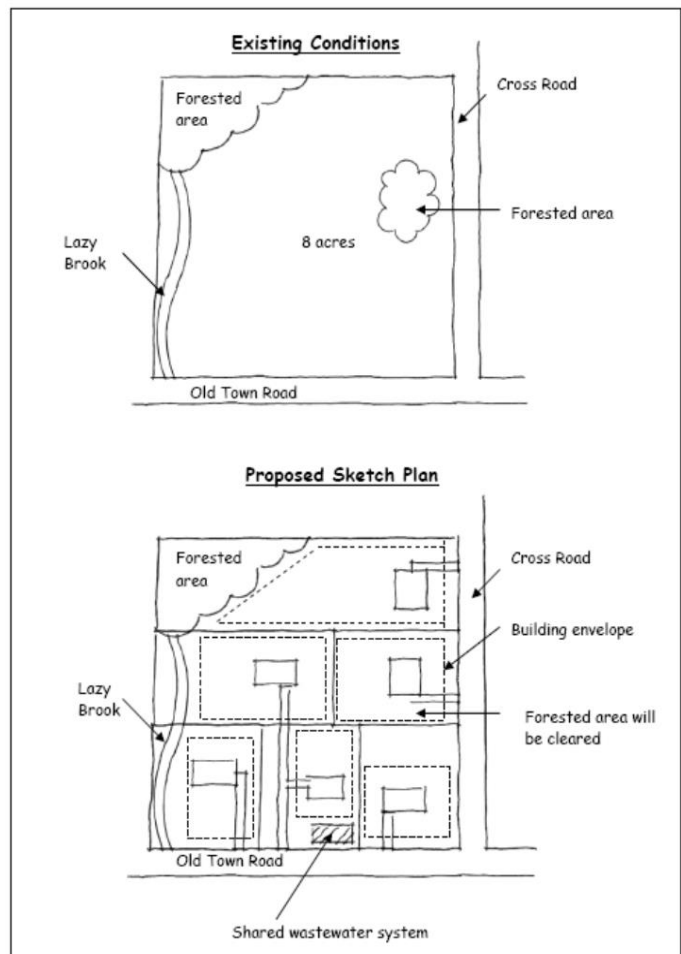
Sketch Plan. The sketch plan review process provides an applicant with the opportunity to get early feedback on their plans for a site. This sample sketch plan shows the level of detail that is expected at this stage in the process. Applicants are encouraged to go through sketch plan review prior to making a significant investment in engineered plans.
